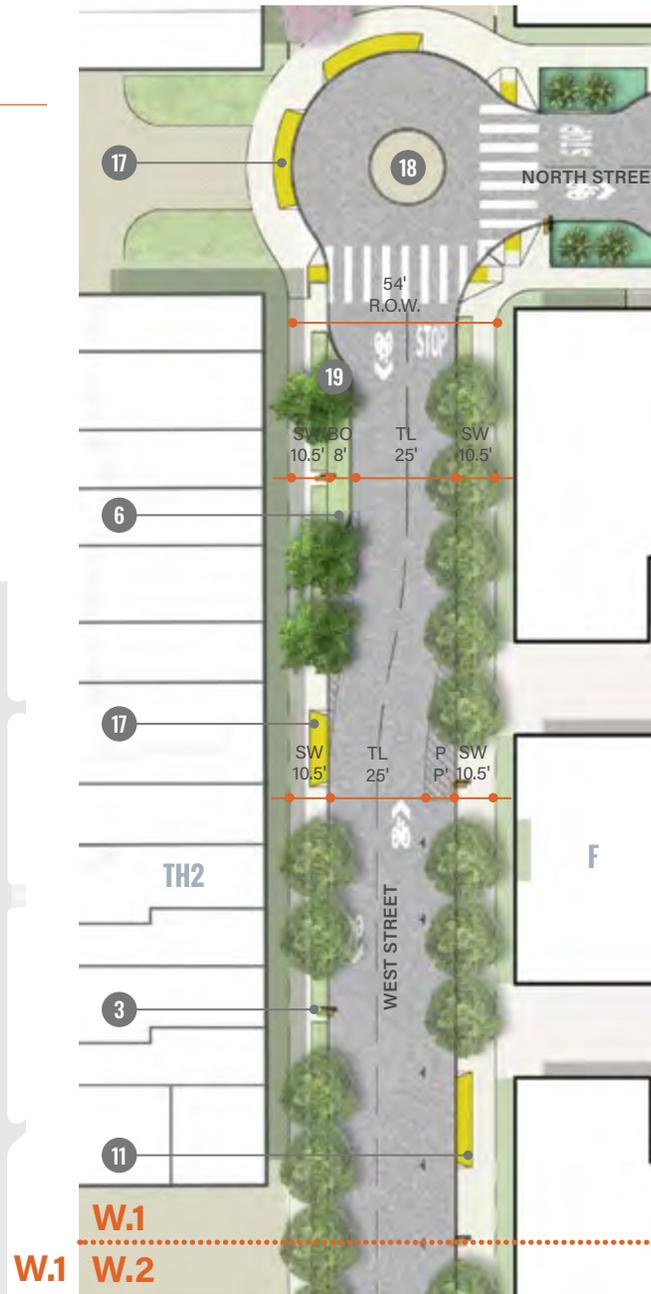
West Street, Plan Enlargements W.1 & W.2
